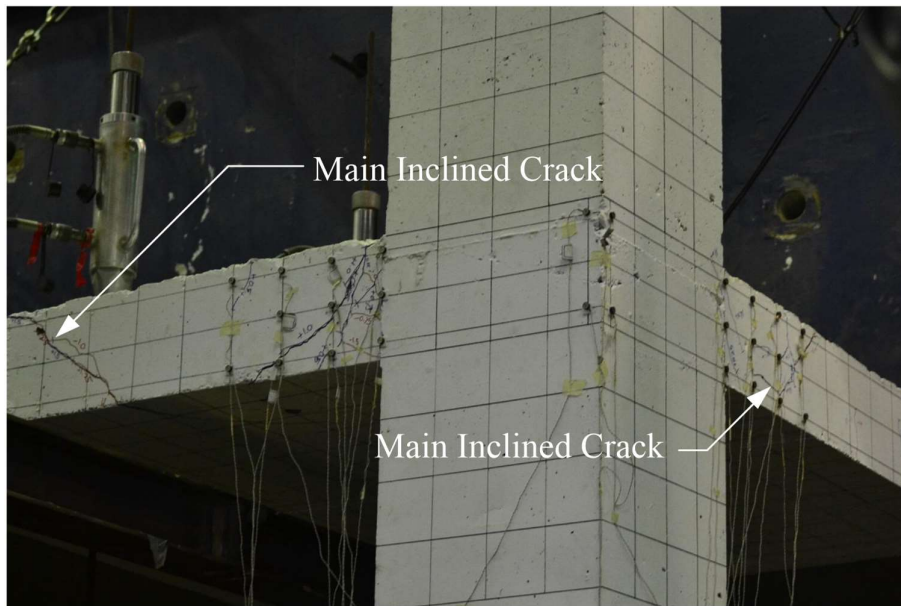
Crack Pattern on the North and West Slab Faces of Specimen R1 at 1.75% Drift
